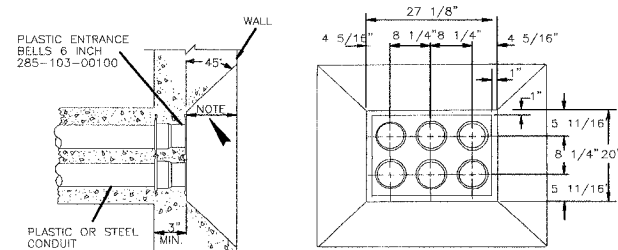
MANHOLE ENTRANCE WITH PLASTIC TERMINATORS (OLDER STYLE) FOR PLASTIC OR STEEL CONDUIT (POCKET TYPE)
